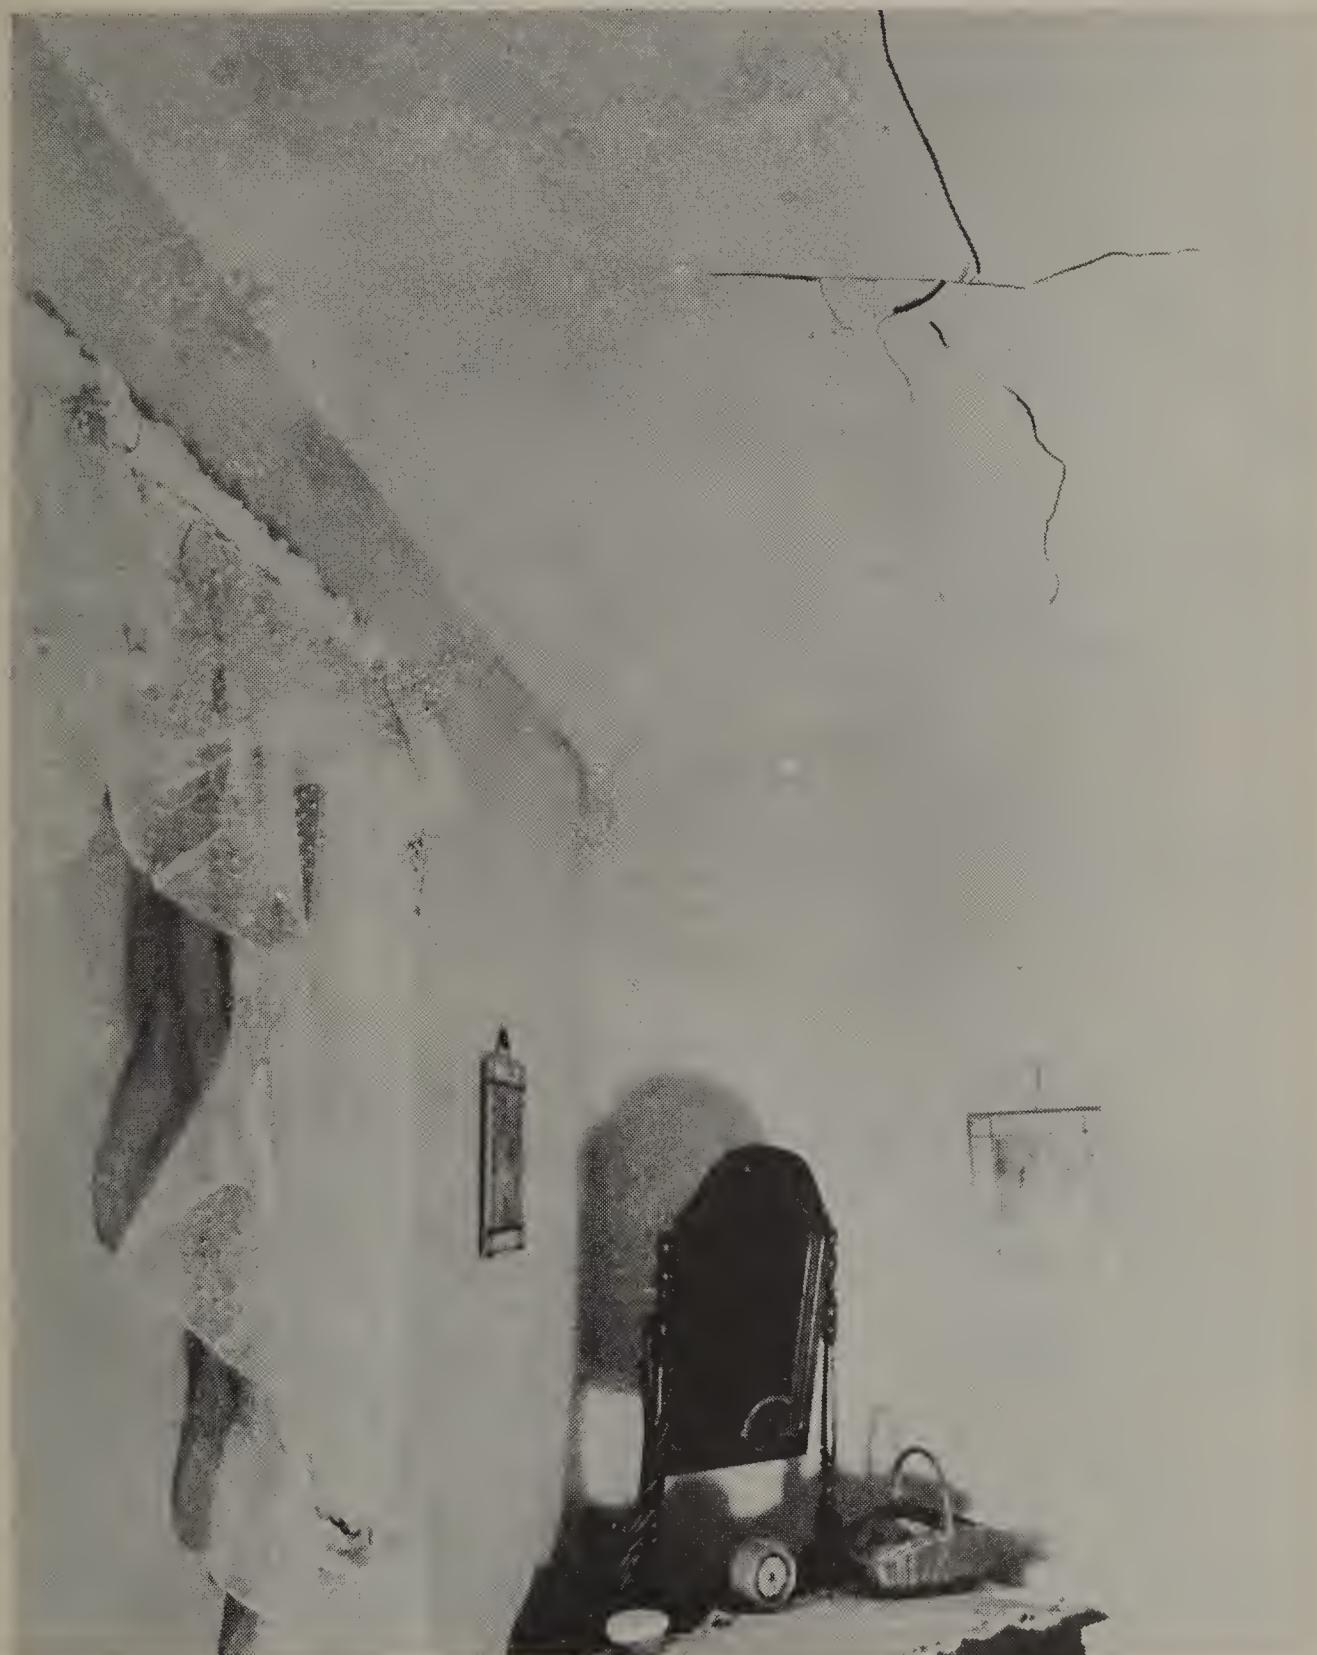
Shows a plaster ceiling under an unventilated flat roof deck where condensation dripped down on the plaster.
